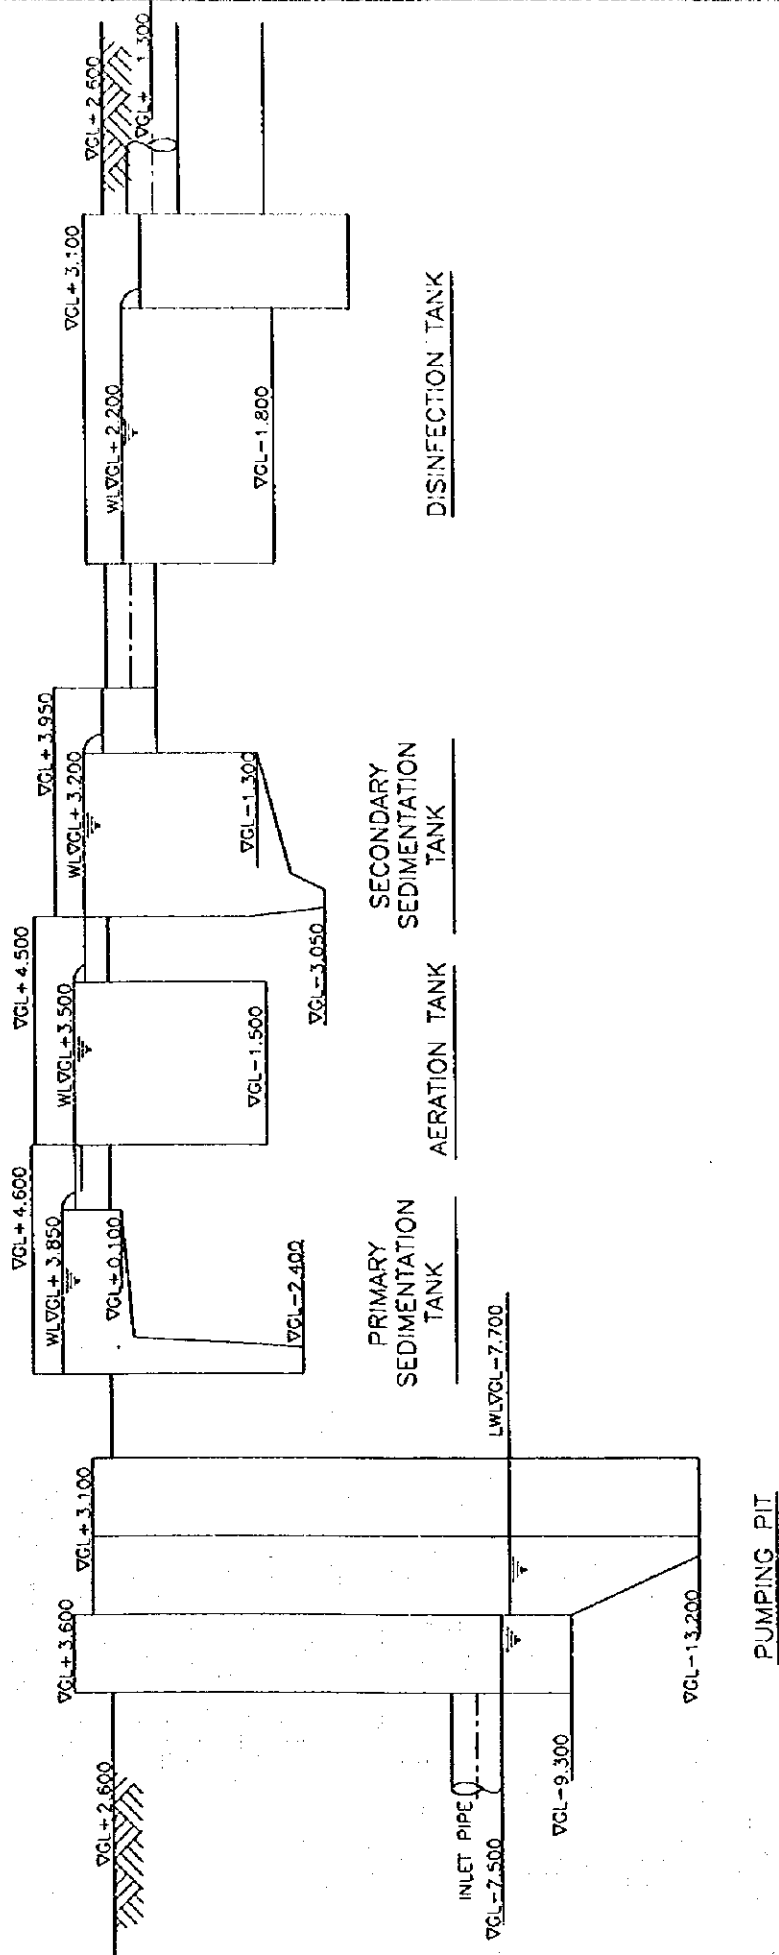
HYDRAULIC PROFILE OF TBNDT WASTEWATER TREATMENT PLANT
